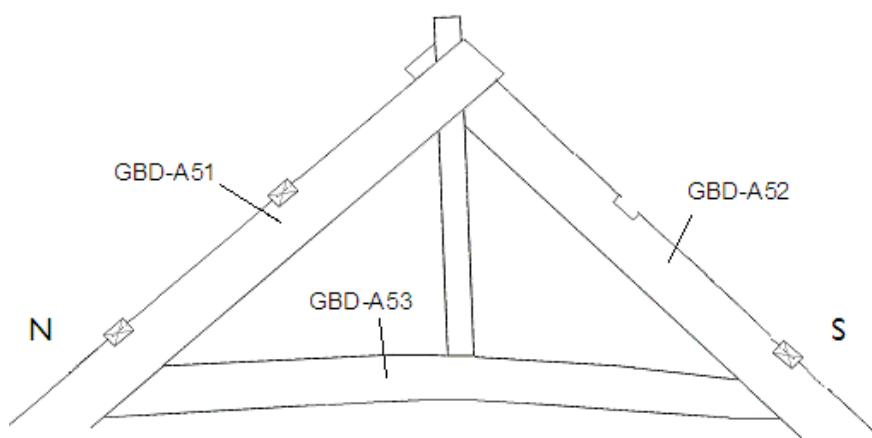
Central range; truss 6 (based on sketch of truss 4), showing the location of samples GBD-A51–3
